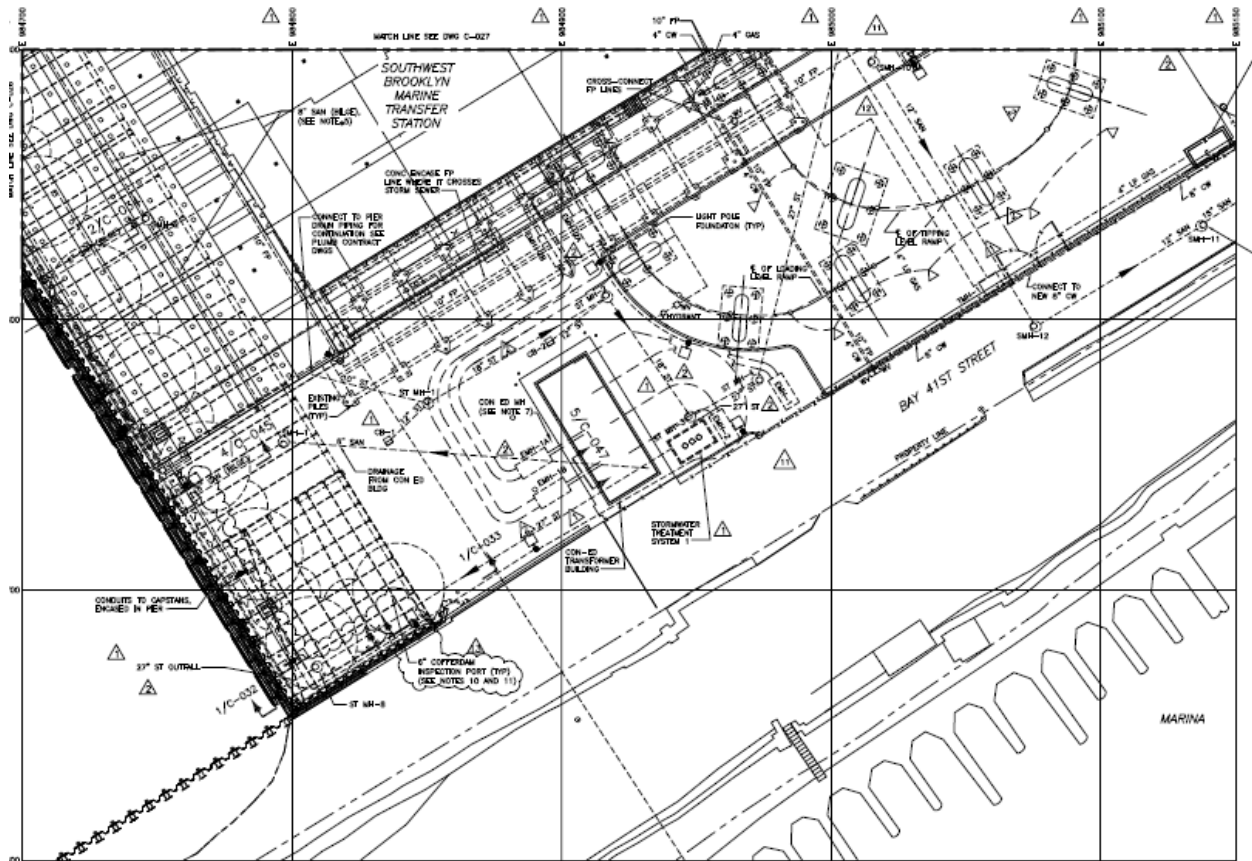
Cofferdam Locations under the Pier Deck and Parking Lot
